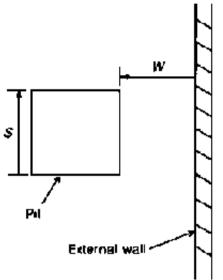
Minimum distance between a pit and the external wall of a house
